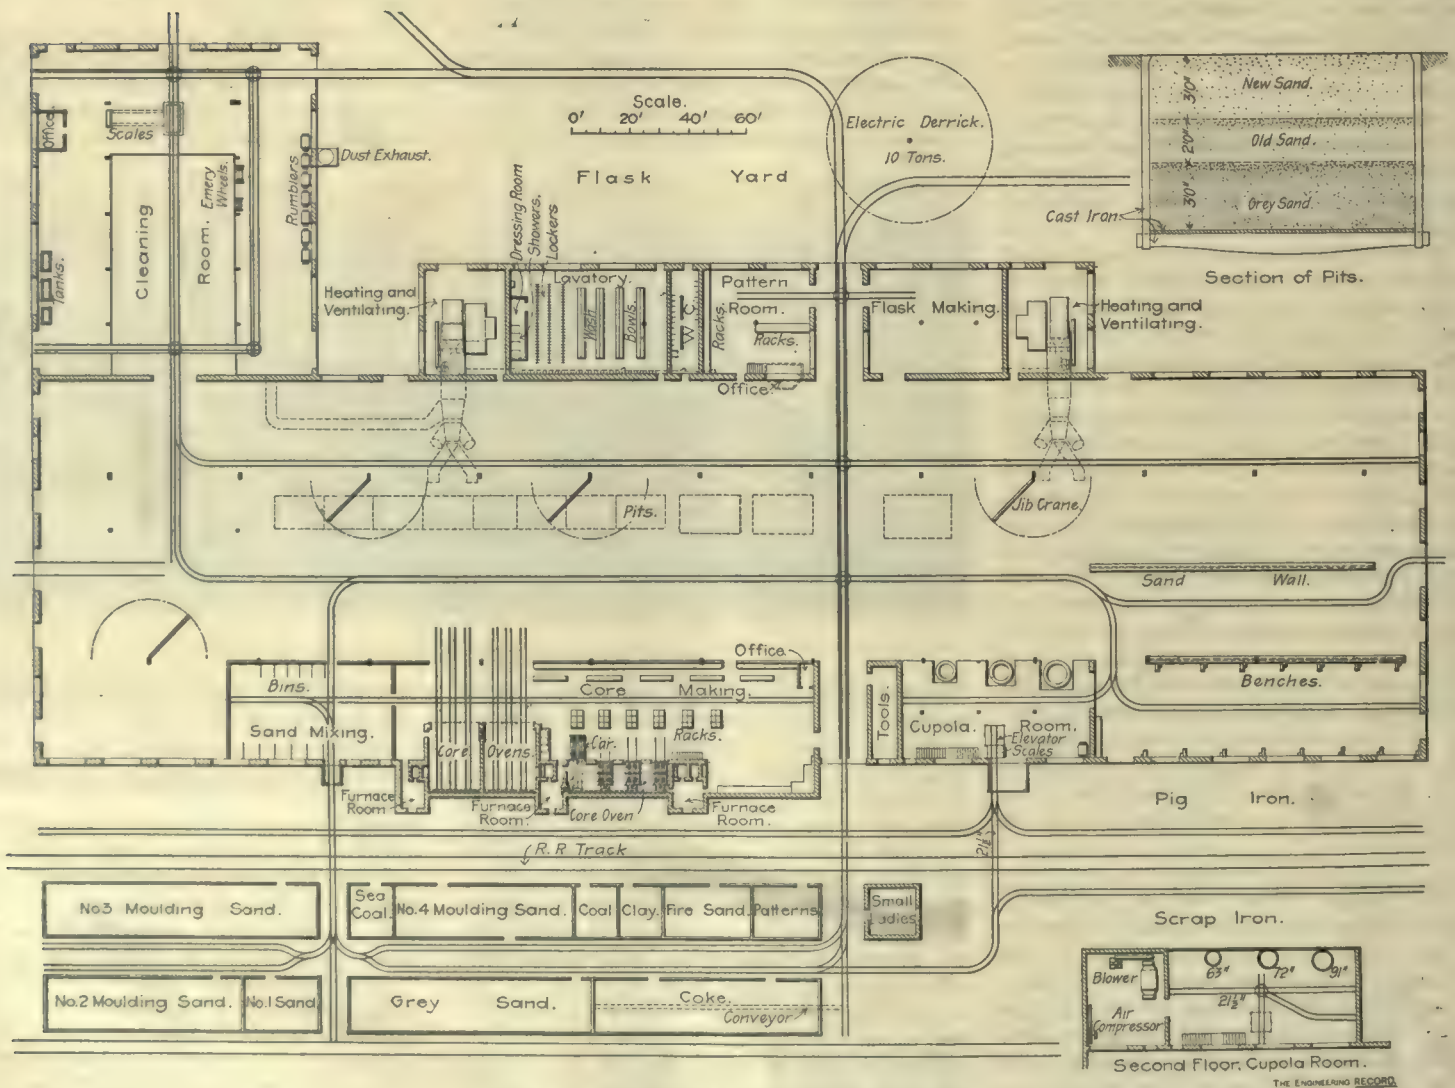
PLAN OF THE BUILDINGS AND TRACKS.
